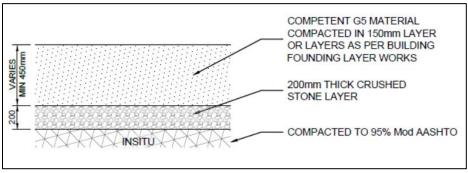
EXCAVATION FOR ROAD LAYERWORKS AT DEPTH (SOURCE: WALTERS, 2020)
